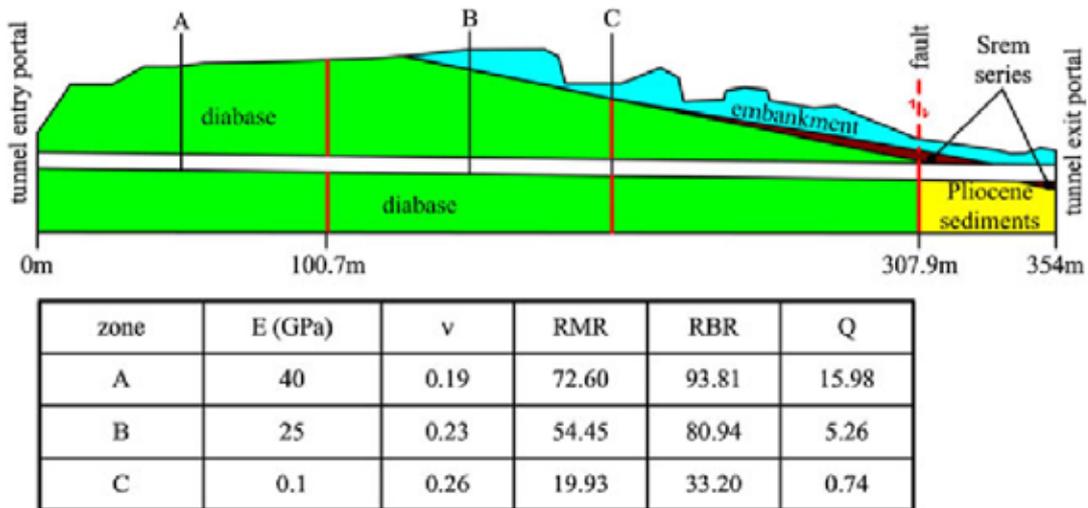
Geotechnical cross-section of the planned tunnel (Source: Djogo et al., 2010)
